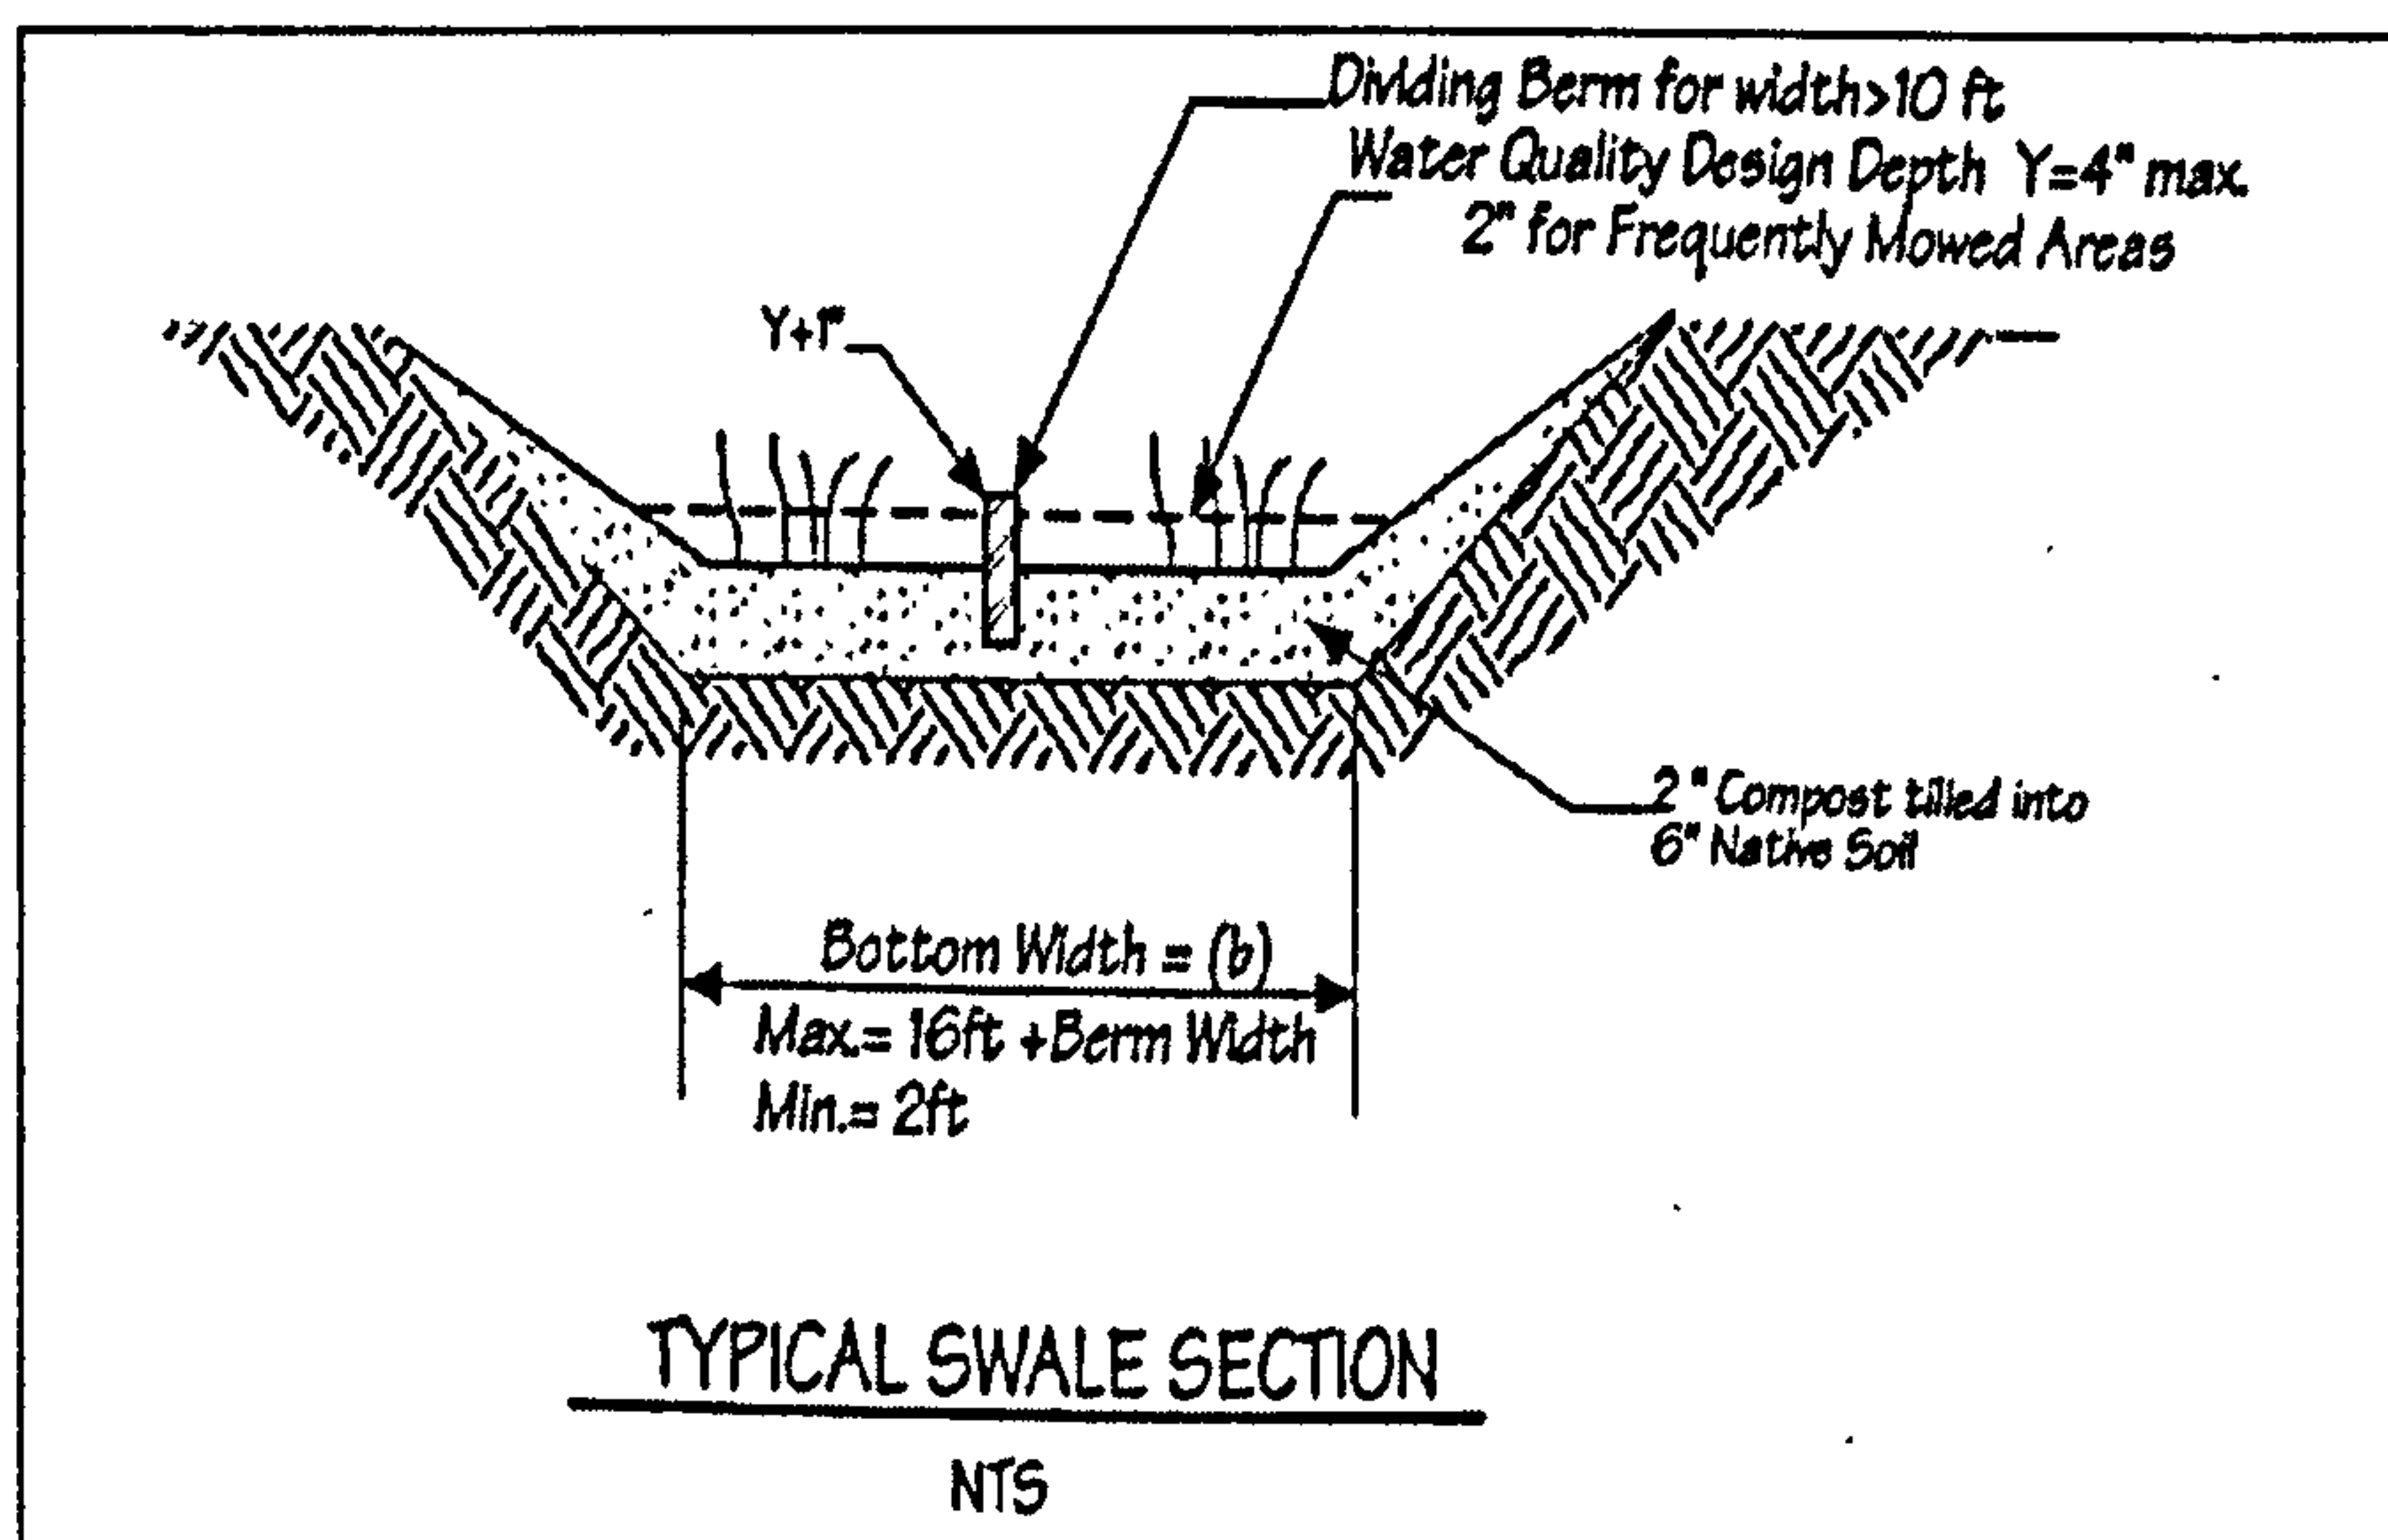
Cross section through a typical grass swale Source: [RBF Consulting, 2001]
